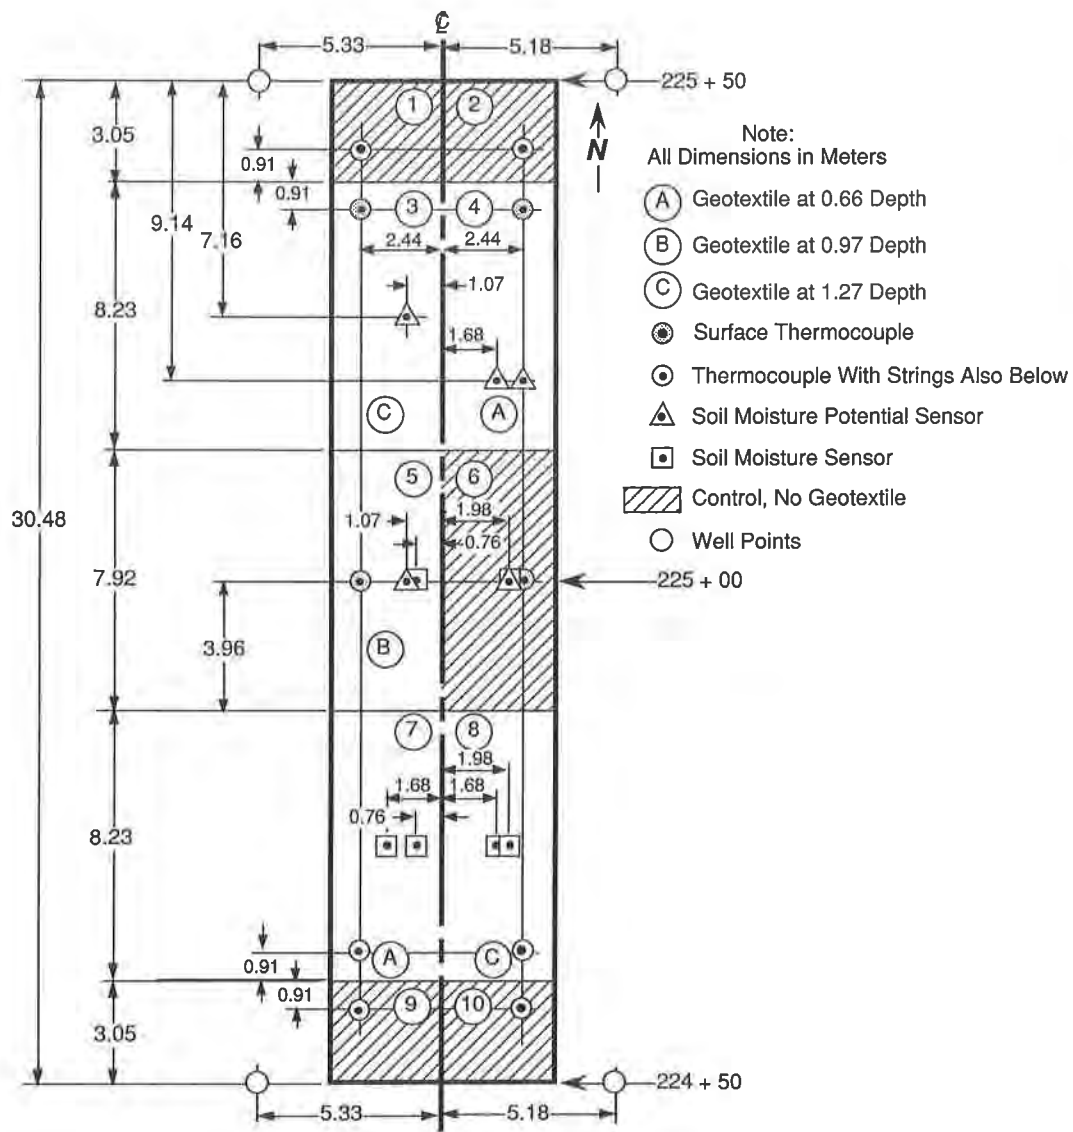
As built plan view of Pittsburg, New Hampshire, geotextile test section.
